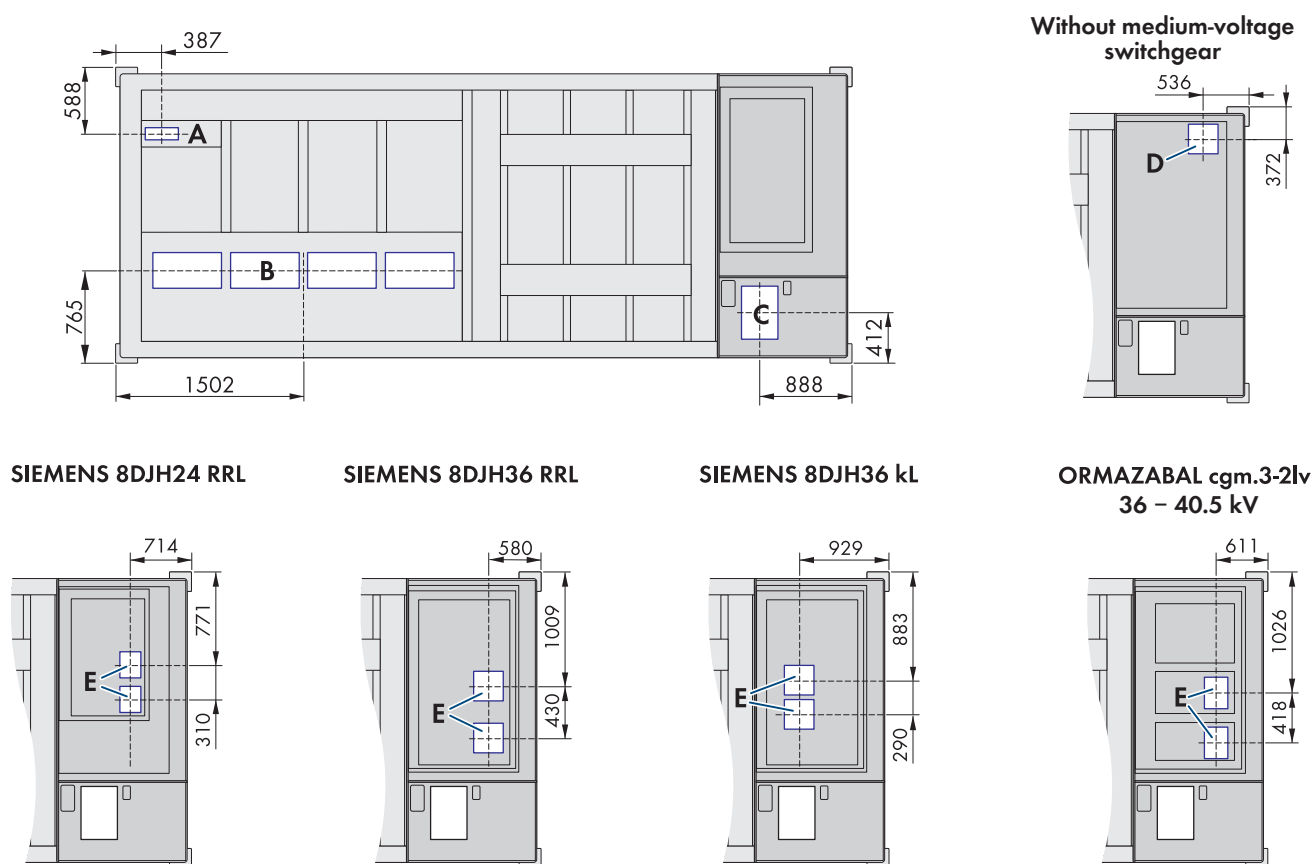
Positions of the openings for cable entry (Dimensions in mm)
